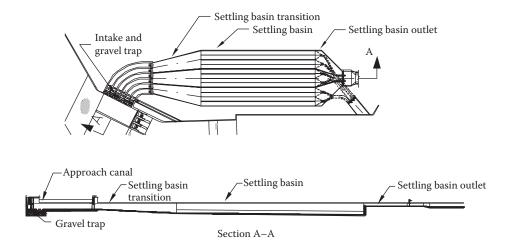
Plan and section of a combined gravel trap and setting basin.
